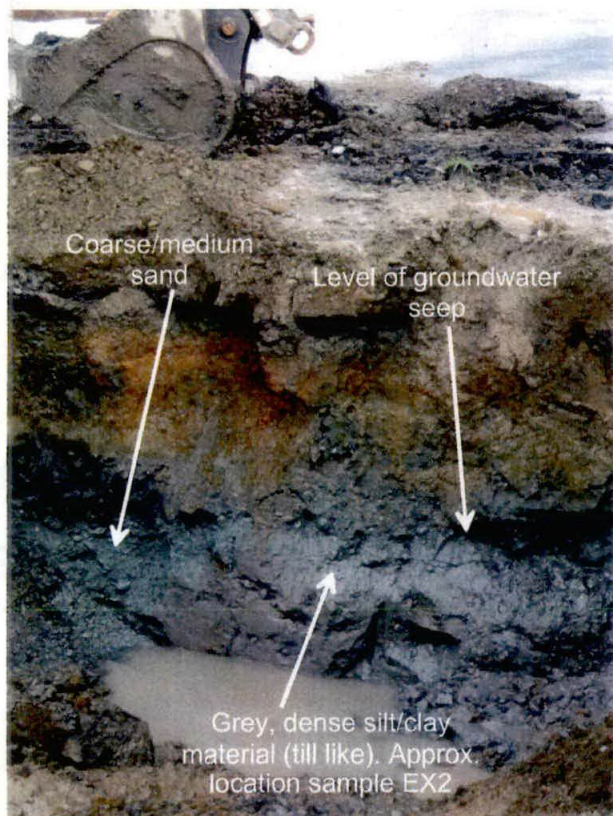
View of east sidewall of excavation. Dense till-like material and looser medium/coarse sand both visible on sidewall. Groundwater seep elevation also depicted. No odors noted in soils screened from this sidewall.
